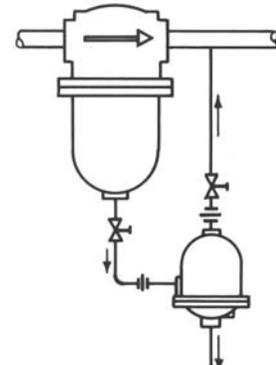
Installation of drainer for separator applications where back venting is necessary. Notice that the drainer is vented to the downstream side of the separator.
